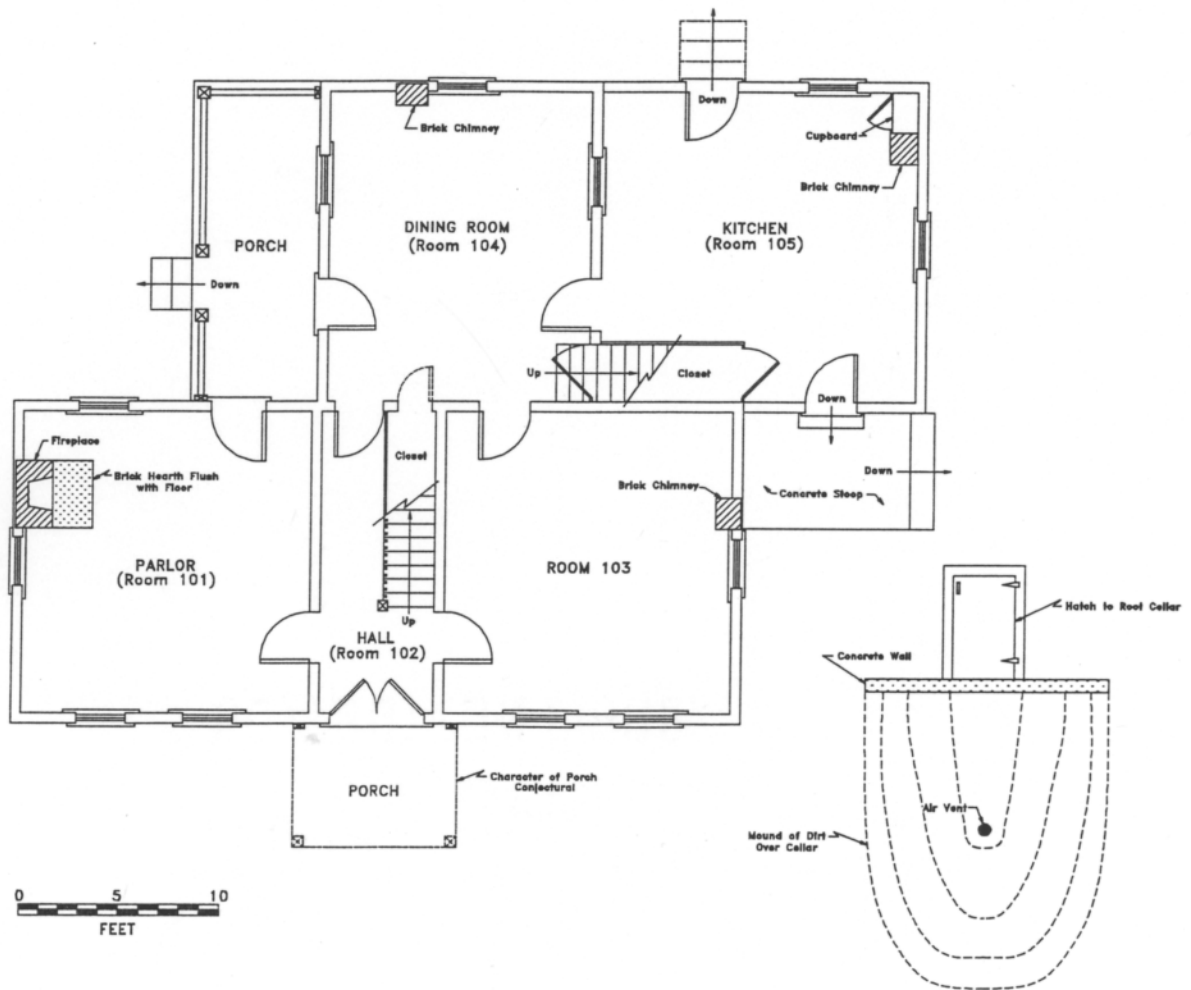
Ground floor plan of the Williamson House, showing construction of the addition flanking the rear wing, ca. 1900.
